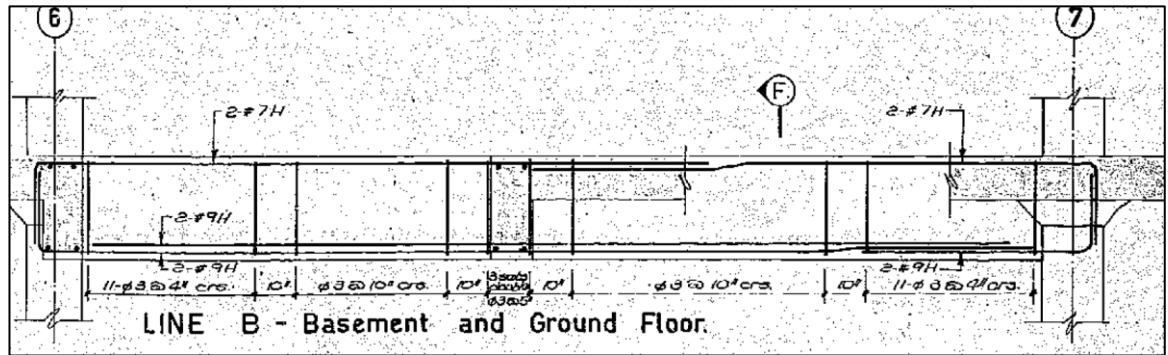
Section plan of the basement and ground floor (source: James Kirkpatrick Group Ltd)
